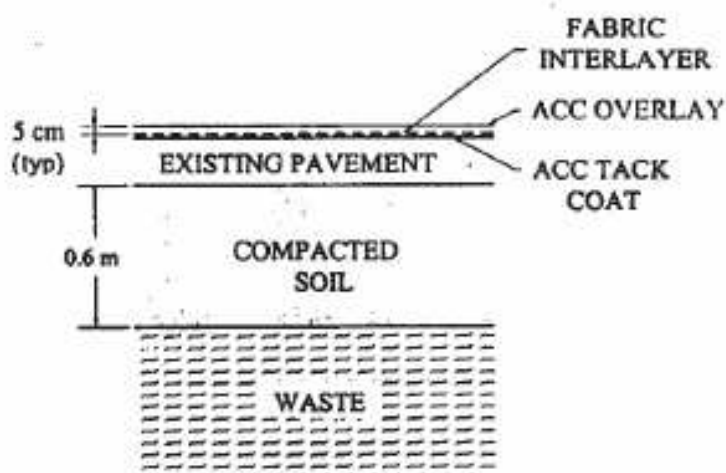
Asphalt cement concrete cover (Kavazanjian and Dobrowolski 2003)
